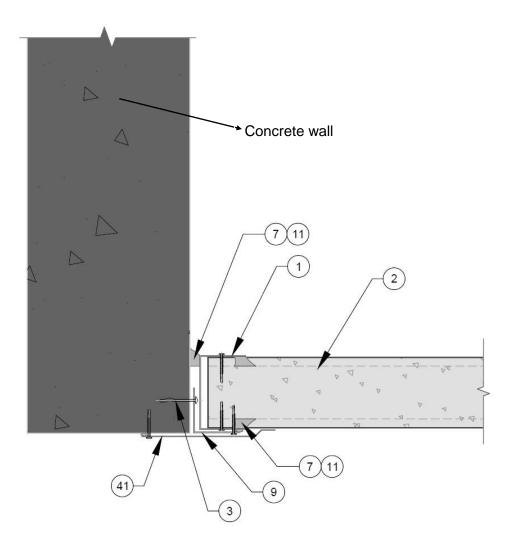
Arrangement of various Corner Details for horizontal panels supported by floor
